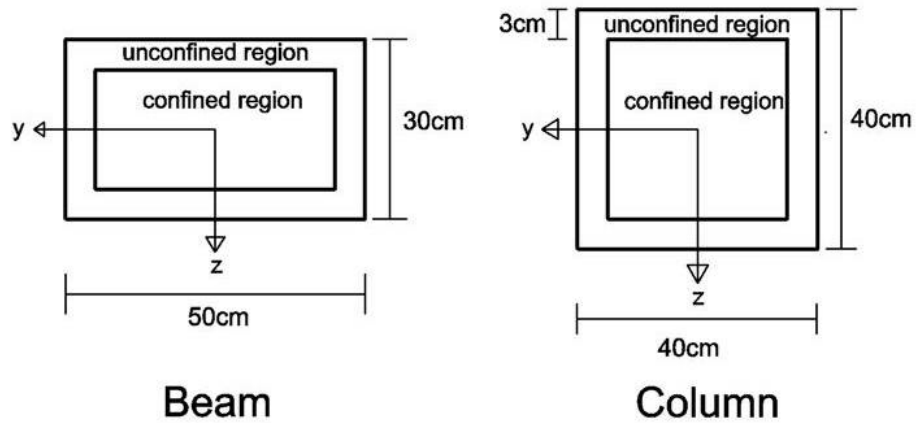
Cross-Sectional Dimensions of the Beams and Columns
